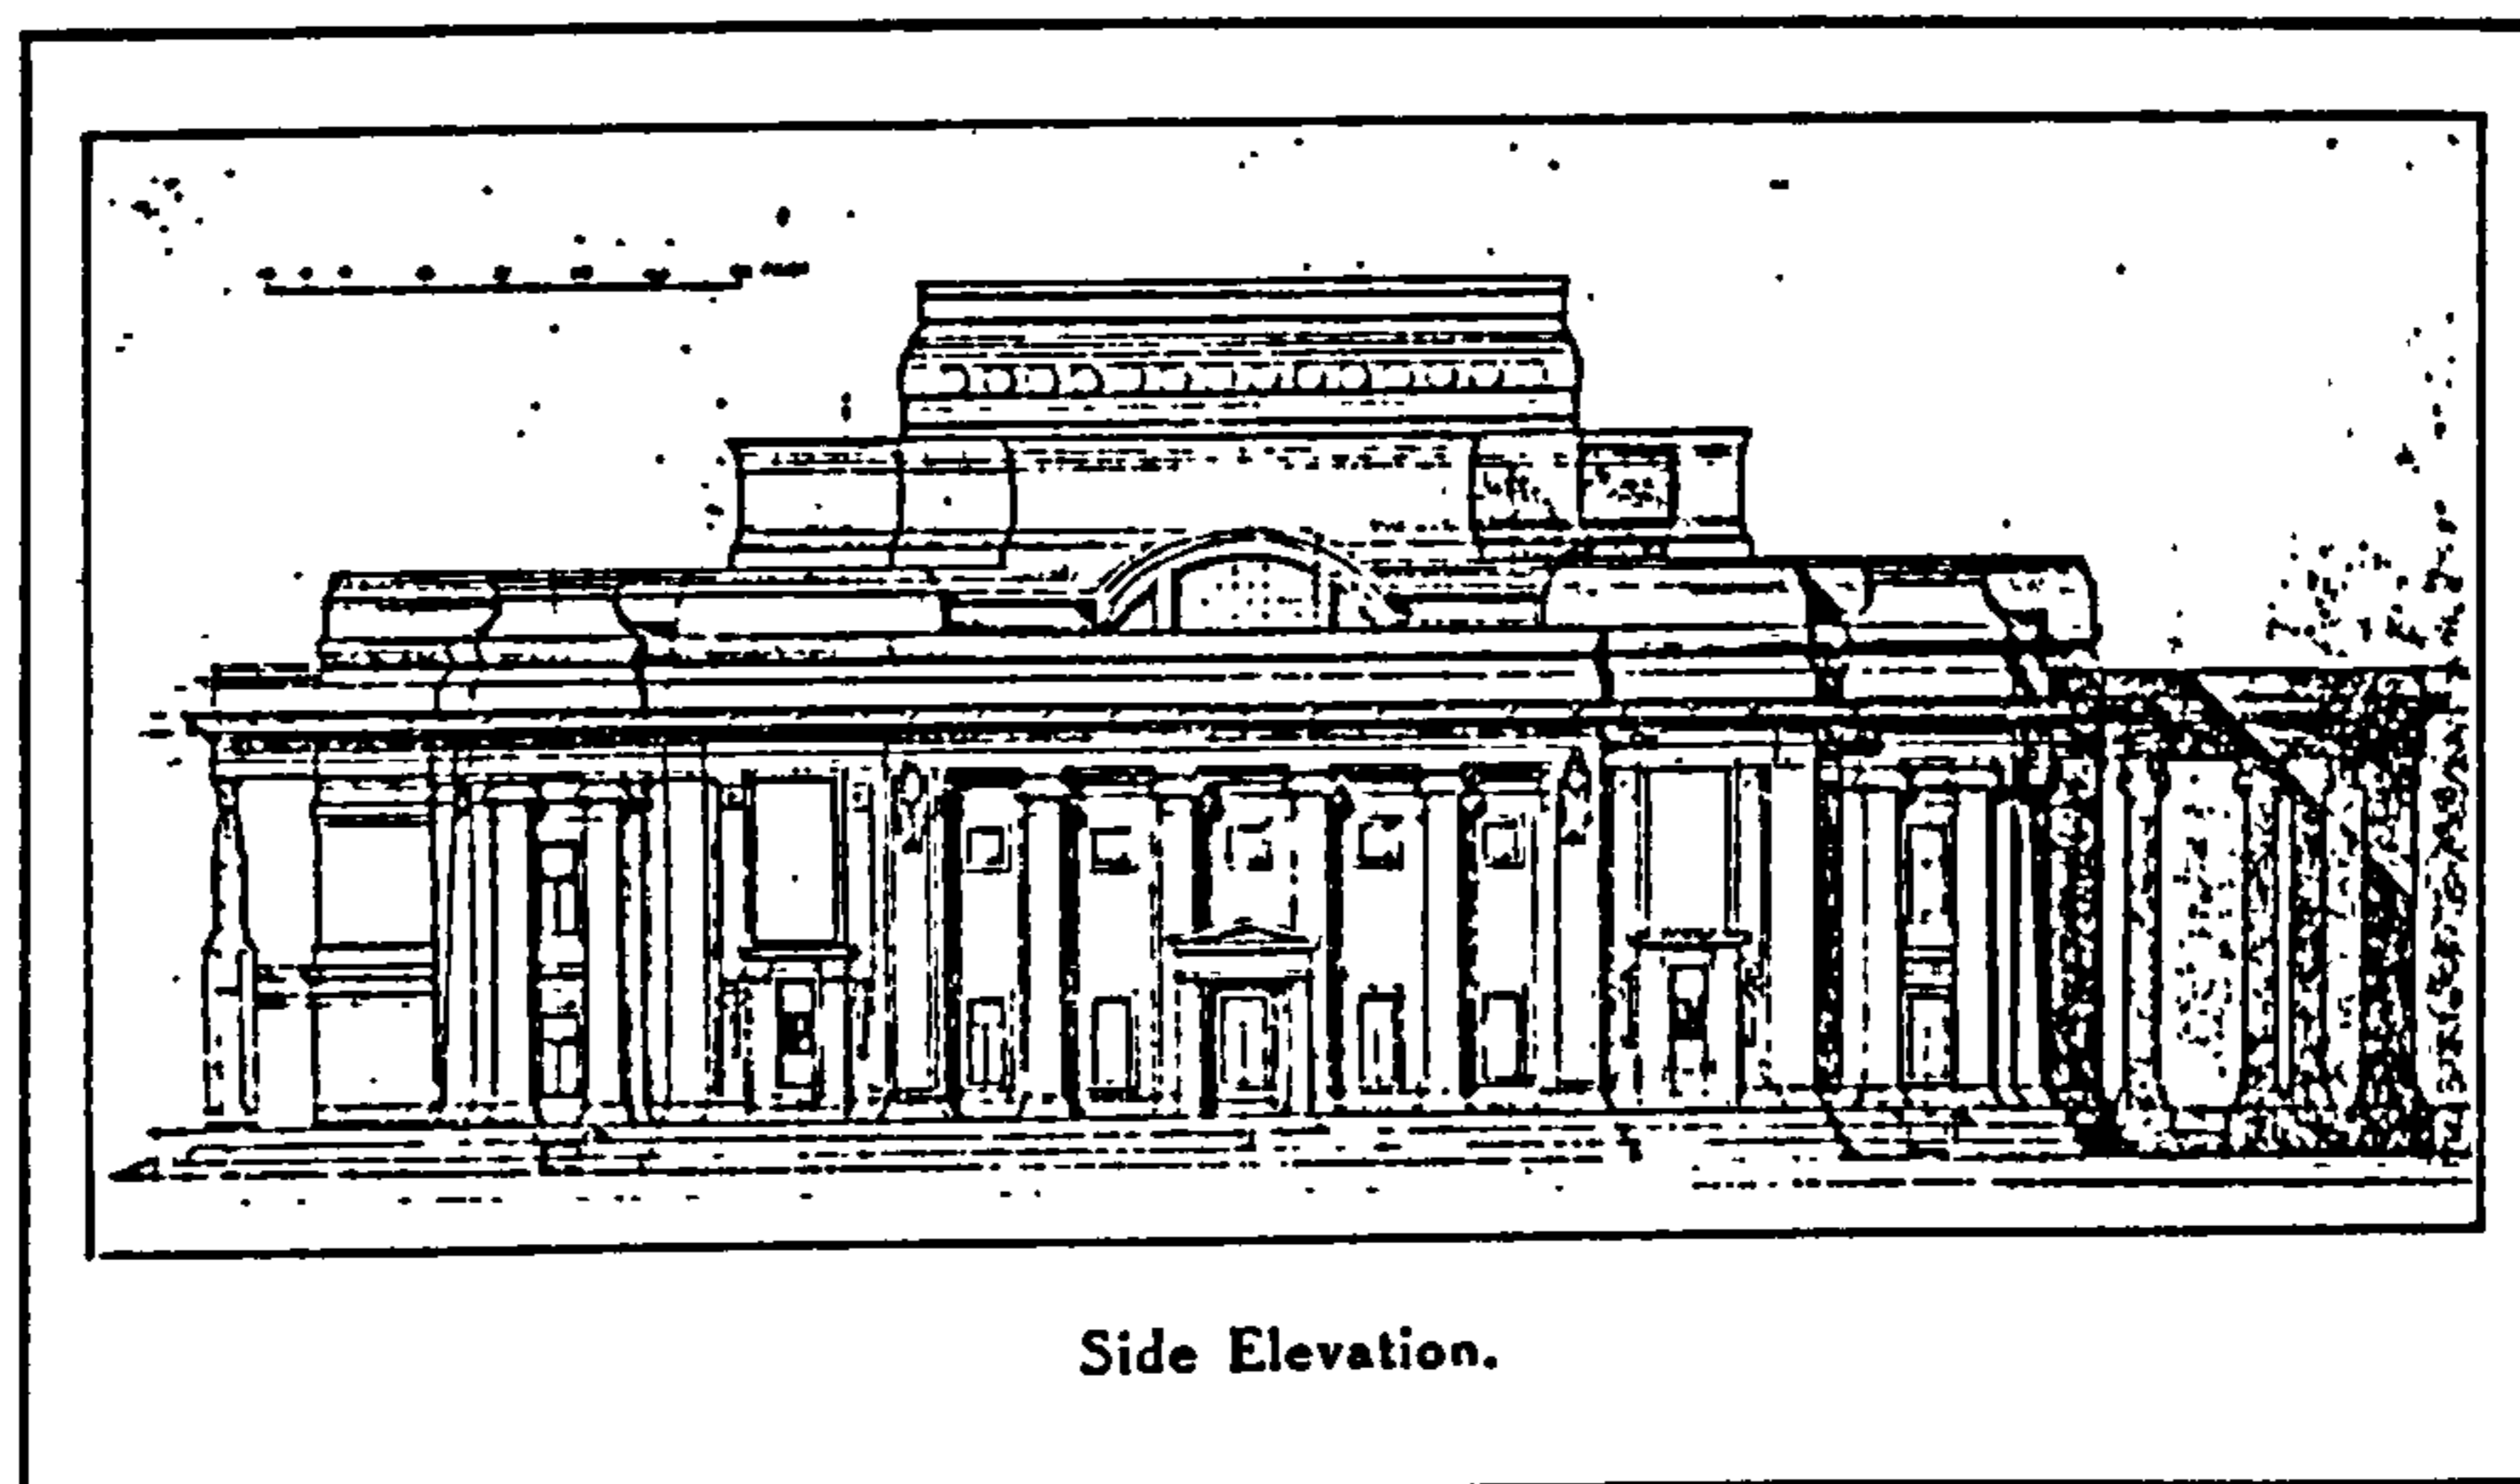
Side elevation. Design for a Guild Hall. R.I.B.A. Soane Medallion.
